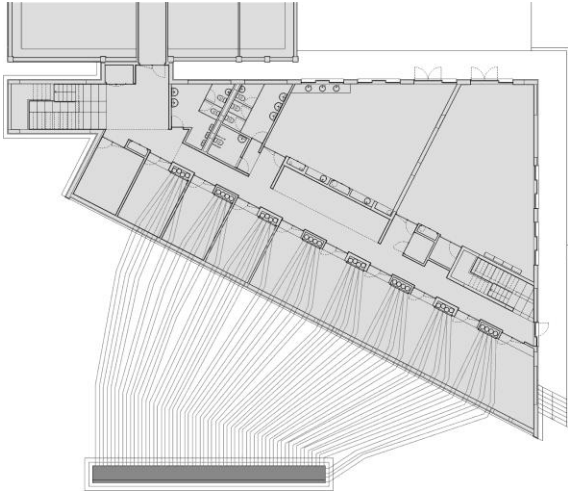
Semi-buried floor plan: ground-heat exchanger ducts.
